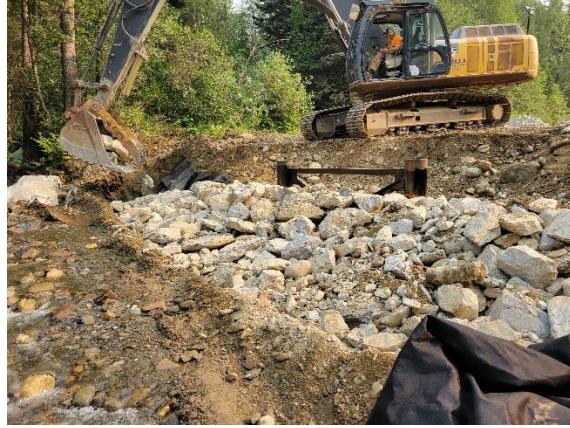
Backfilling of spread footings. (July 22, 2024).
